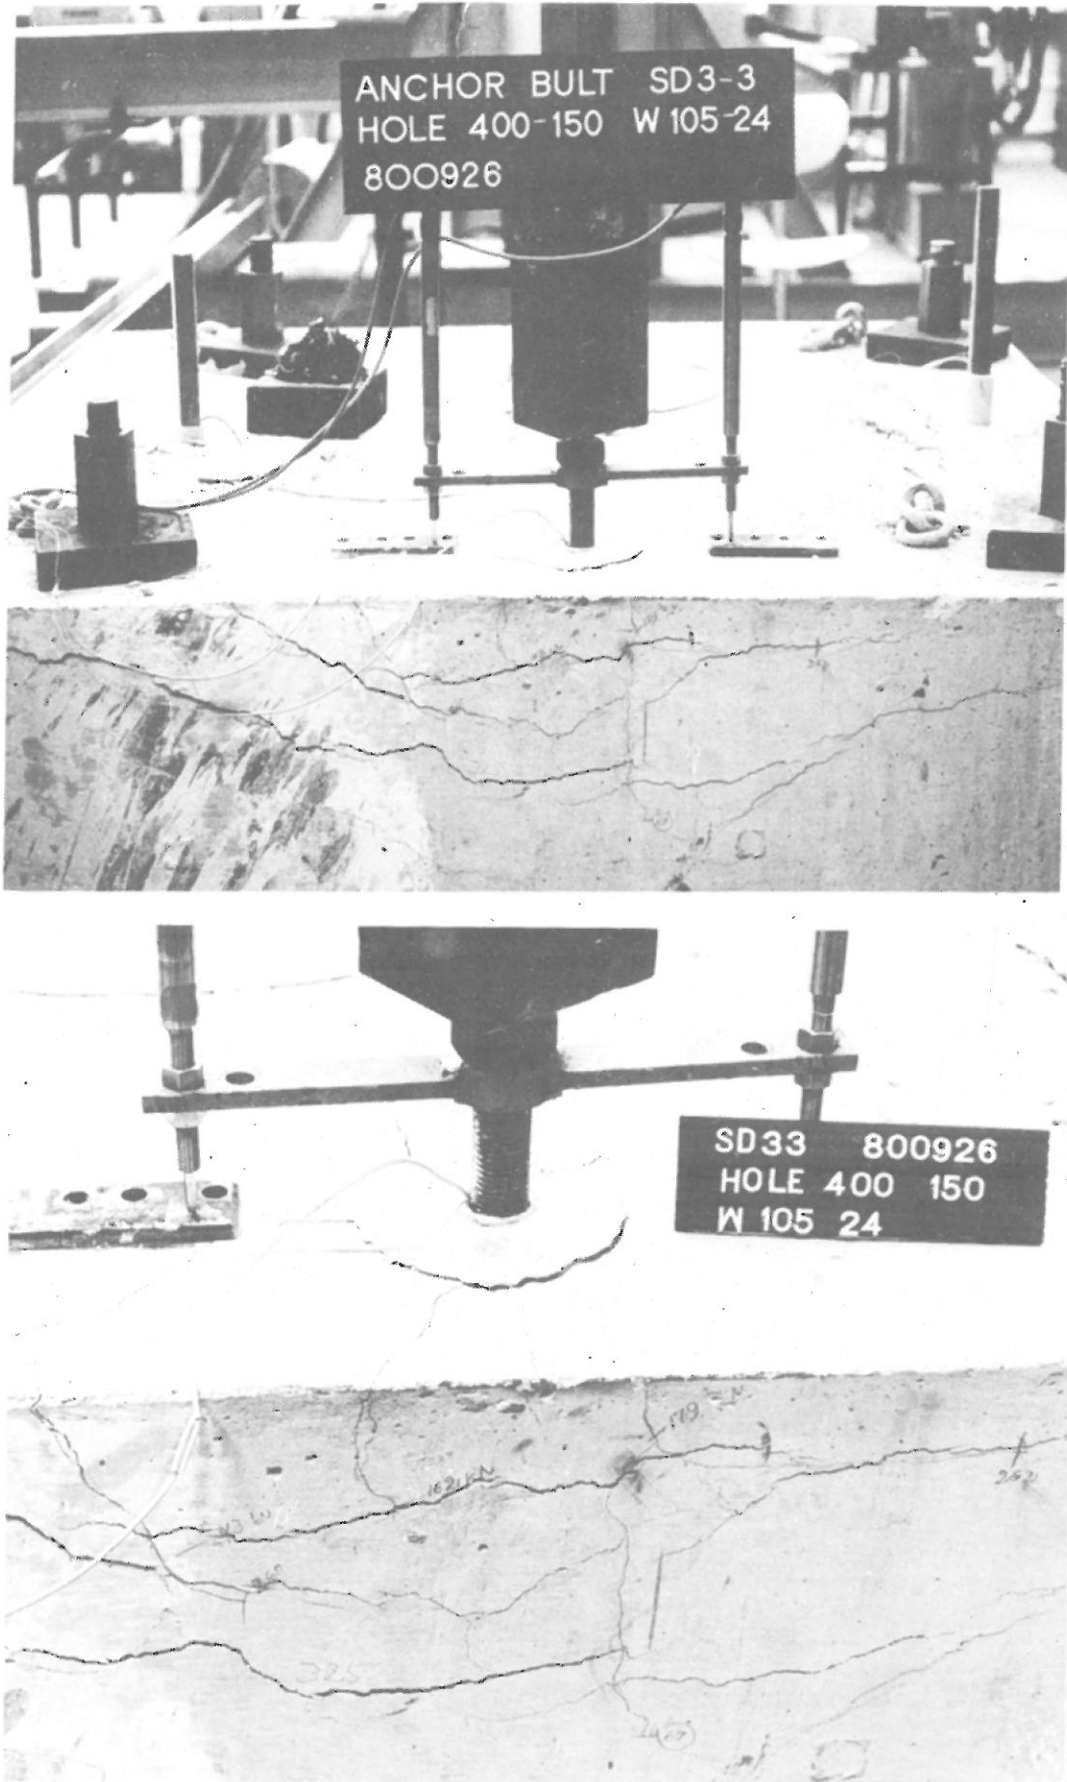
Anchor bolt SD 3:3A at failure (second loading of bolt SD 3:3). Drilled hole with 400 mm depth and 150 mm edge distance. Anchor bolt M30 with washer $\phi 105 \times 24$. Reinforcement $\phi 10$ Ks 400 # 200. Ultimate load.
